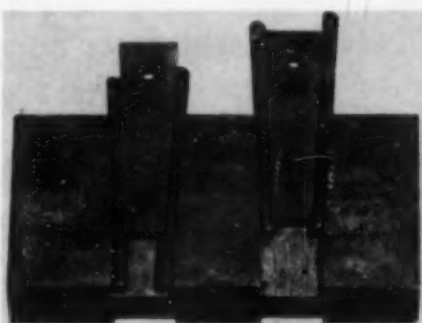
DESIGN OF PRESTRESSED BEAM shows no tension in concrete.
